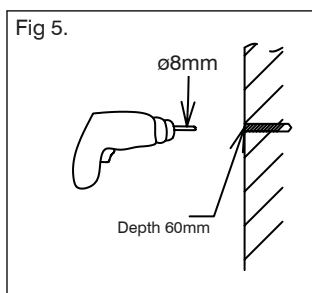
Drill 2 holes ø8mm, 60mm depth for solar panel
